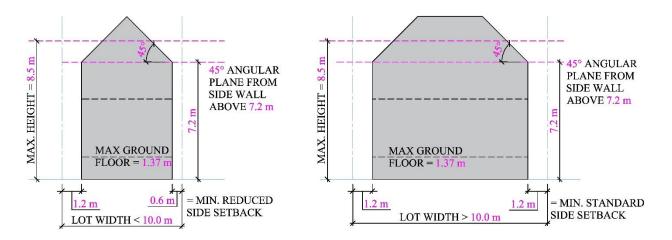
K.F7: Perpendicular Massing on Pitched Roof Building
